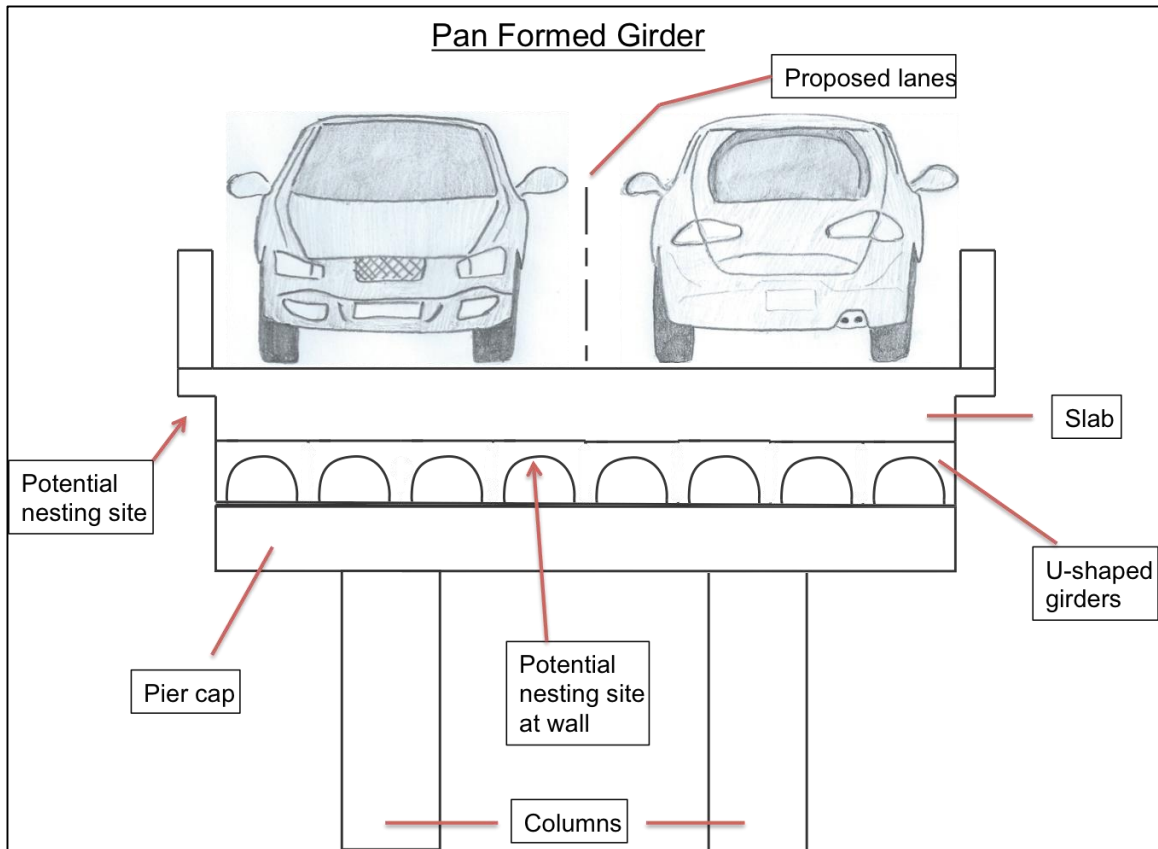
Cross-section view of a slab and girder pan formed bridge with potential nesting sites
